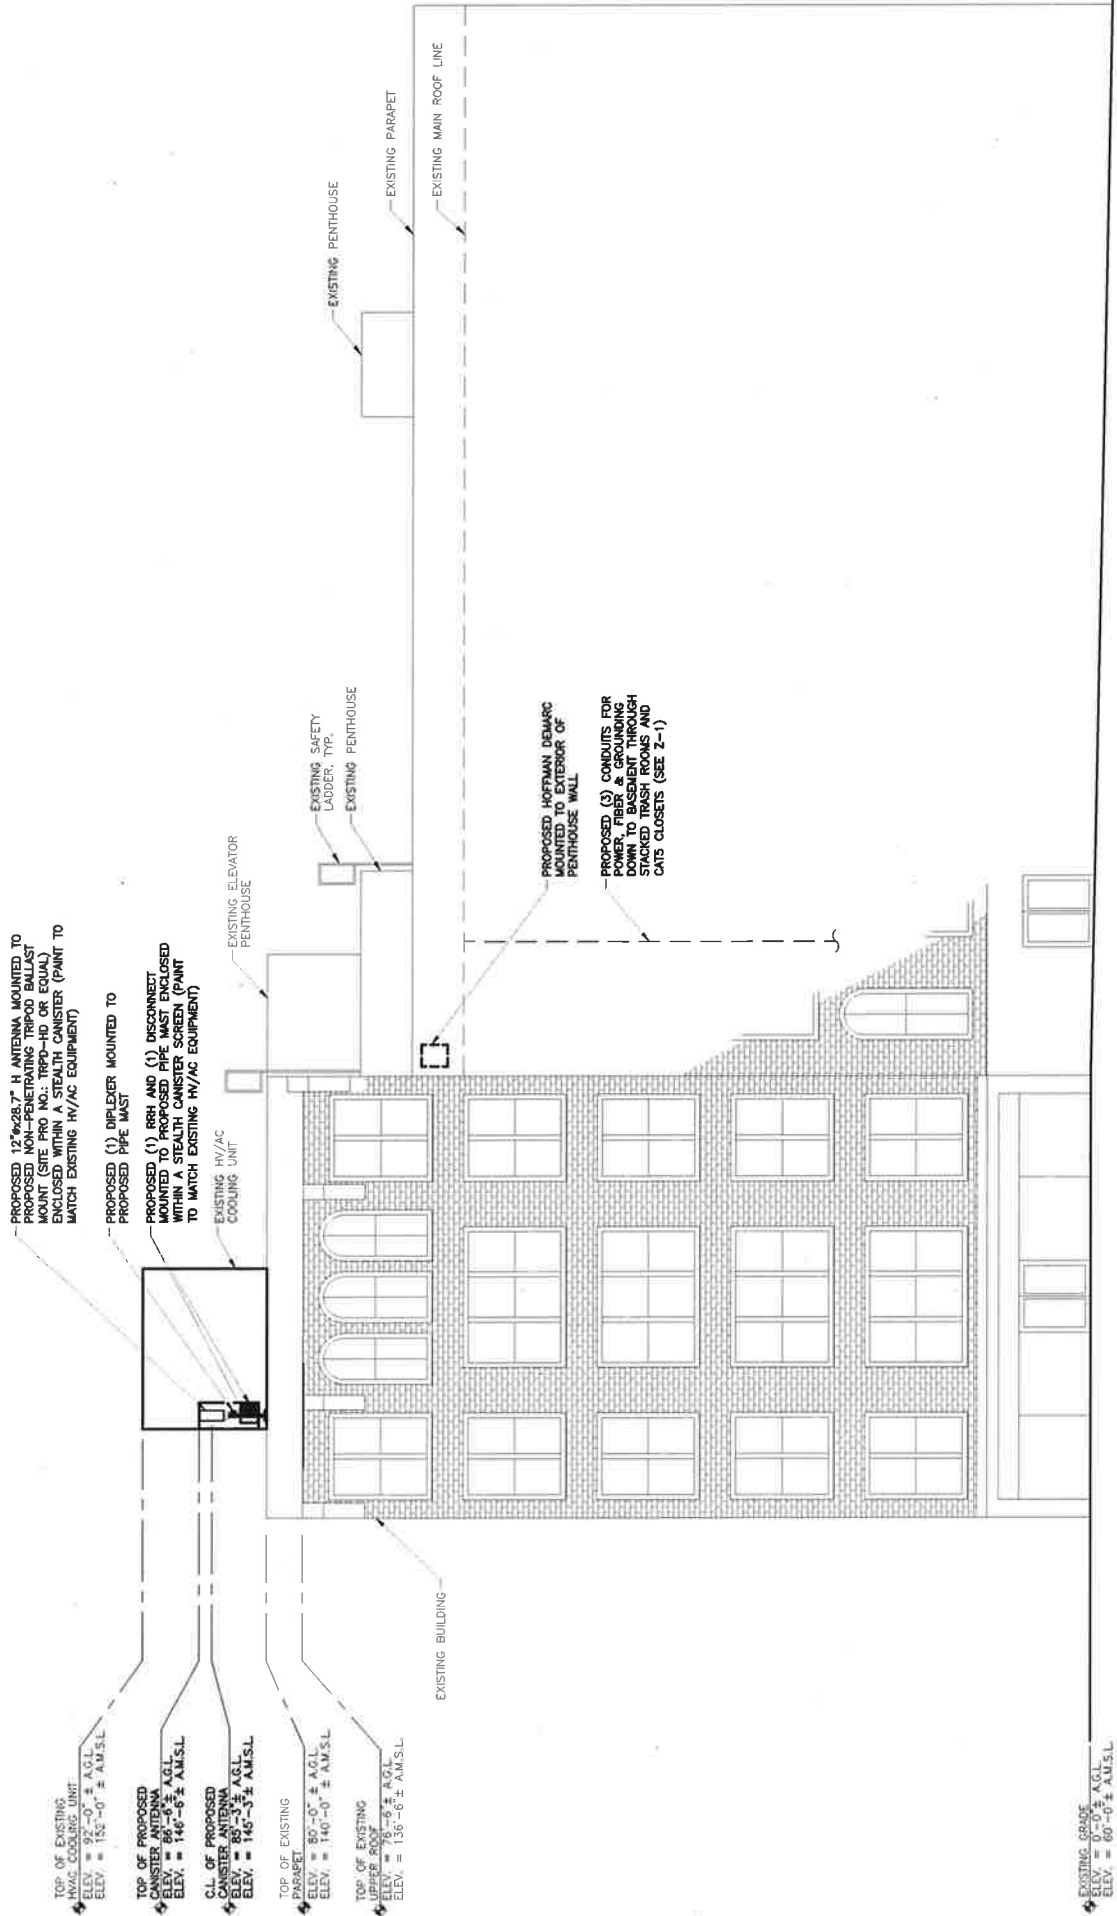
PROPOSED EQUIPMENT ELEVATION PLAN
